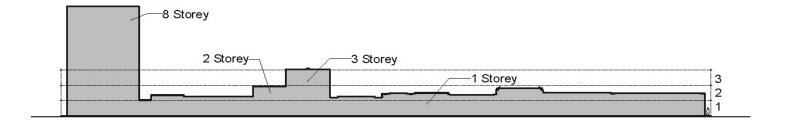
Existing Massing 101st Street, 1100 Block West, KSCZ
